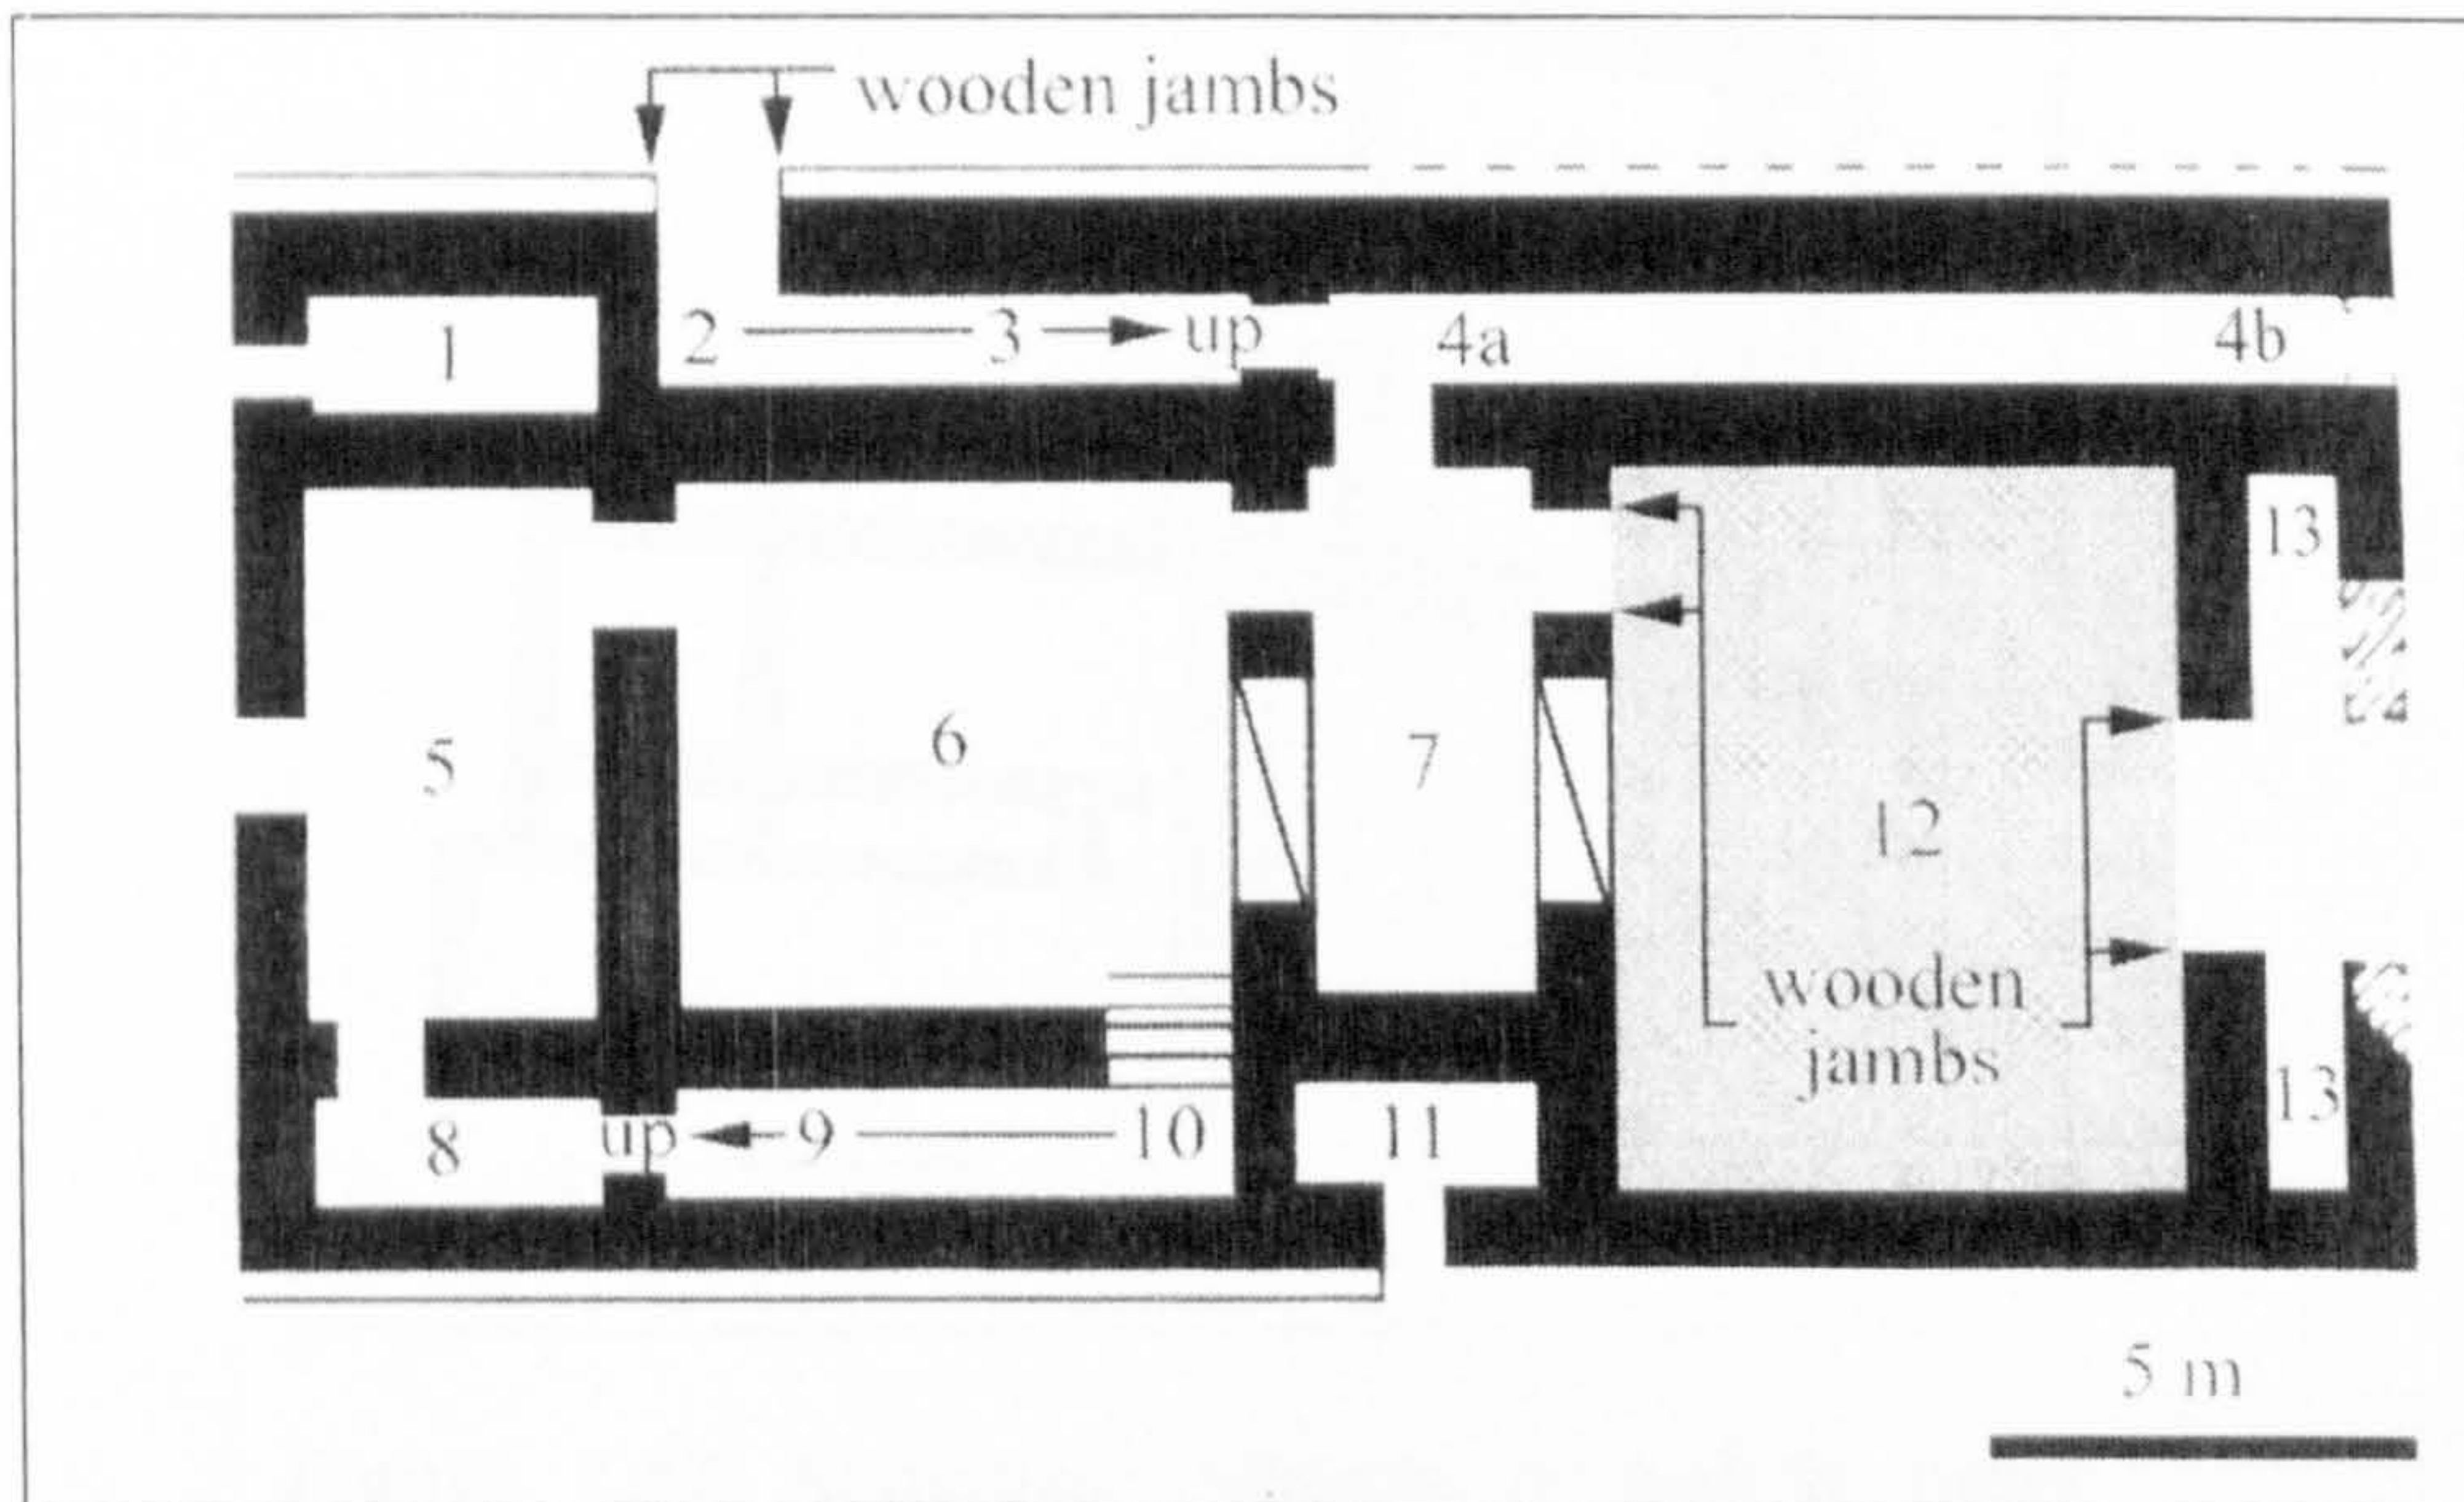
Lerna, House of the Tiles: Plan of ground floor with evidence for doors indicated (adapted from Shaw 1987: Fig. 3a; Pullen 1986: Fig. 34).
